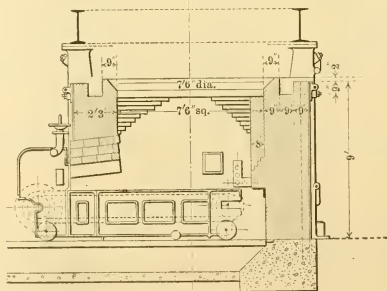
SECTION OF FURNACE OF THE BOILER SHOWN ON PAGE 279
